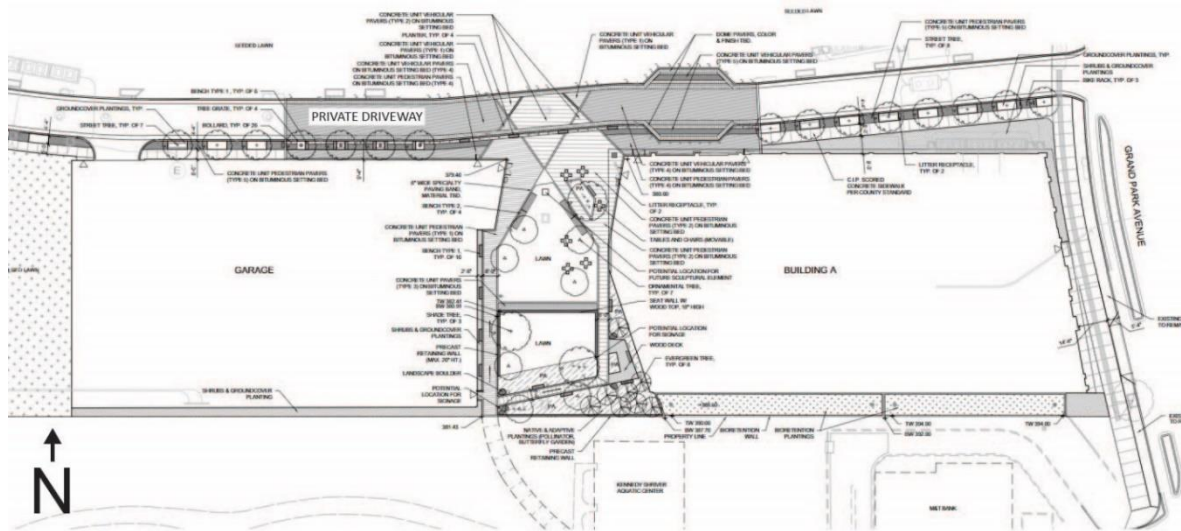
Through-block Connection Phase 1 Landscape Plan
